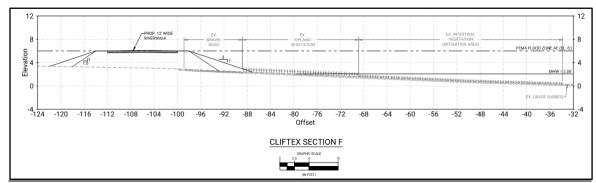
Cross section of River Walk elevated to the 100-year flood elevation on proposed fill
